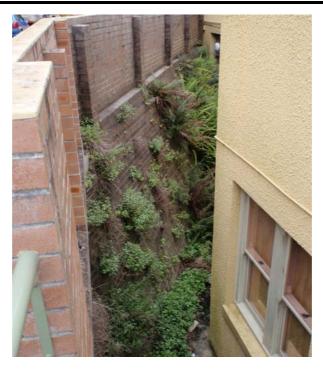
Retaining Wall on the Cooper street Boundary (eastern side)
